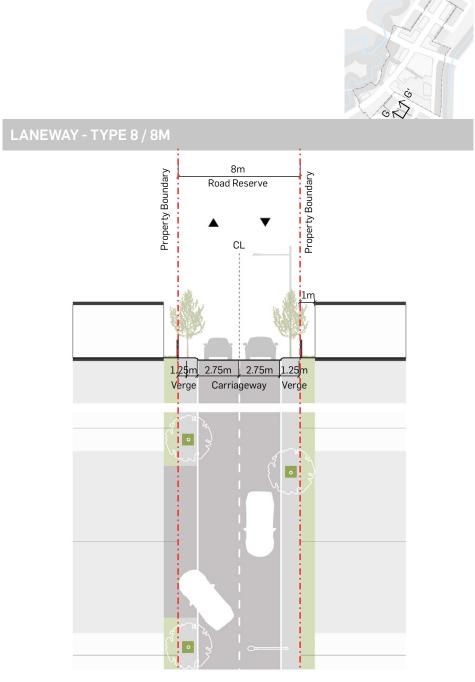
Indicative Street Section G-G' - Laneway - Type 8
